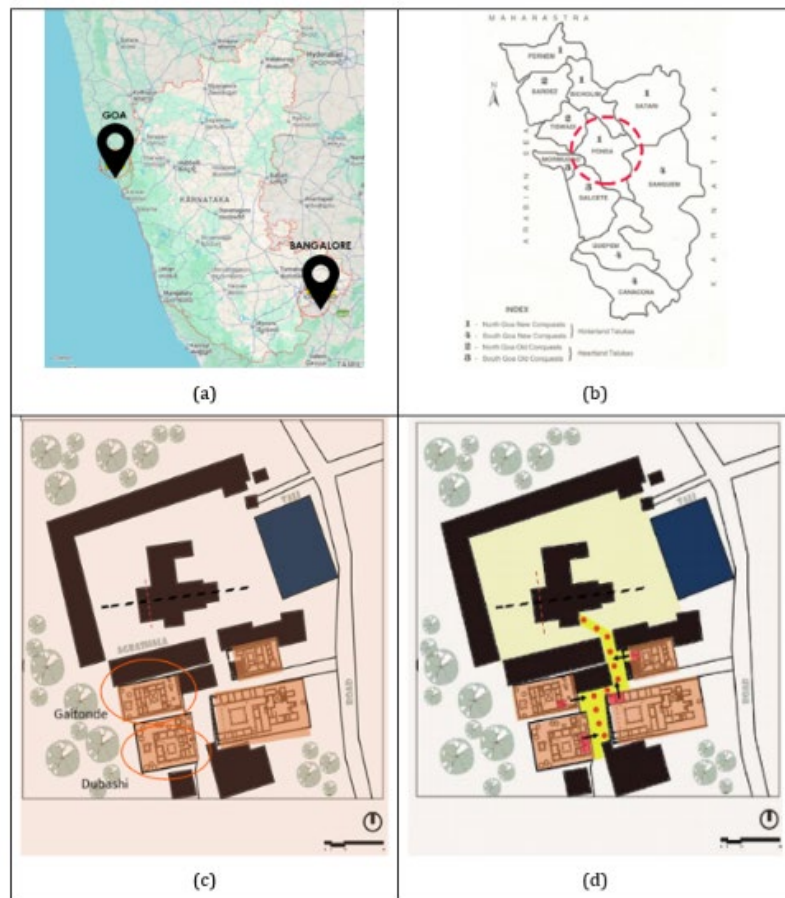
(a) Location plan; (b) Location plan of Ponda in Goa; (c) Site plan showing priest houses outside temple prakara; (d) The sacred path to the temple from the southern side
